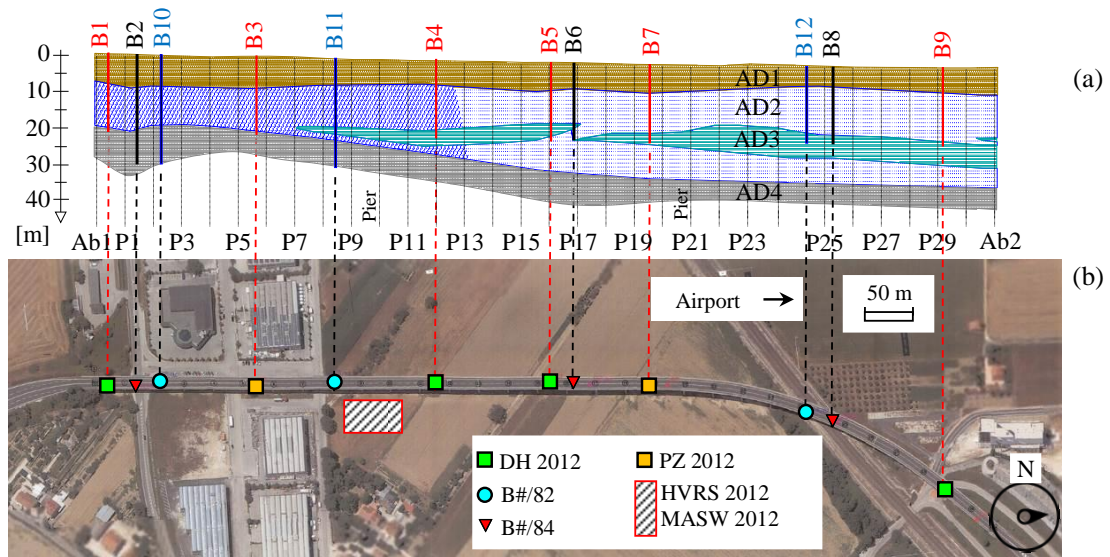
(a) Soil geological profile, (b) position of the test site and geotechnical surveys.
